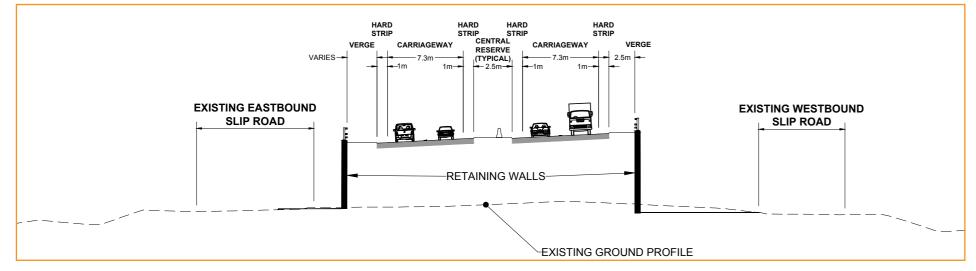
The cross-section above illustrates how the flyover would be constructed between the existing approaches to Countess roundabout which would then become the slip road connections between the new A303 and the A345.
